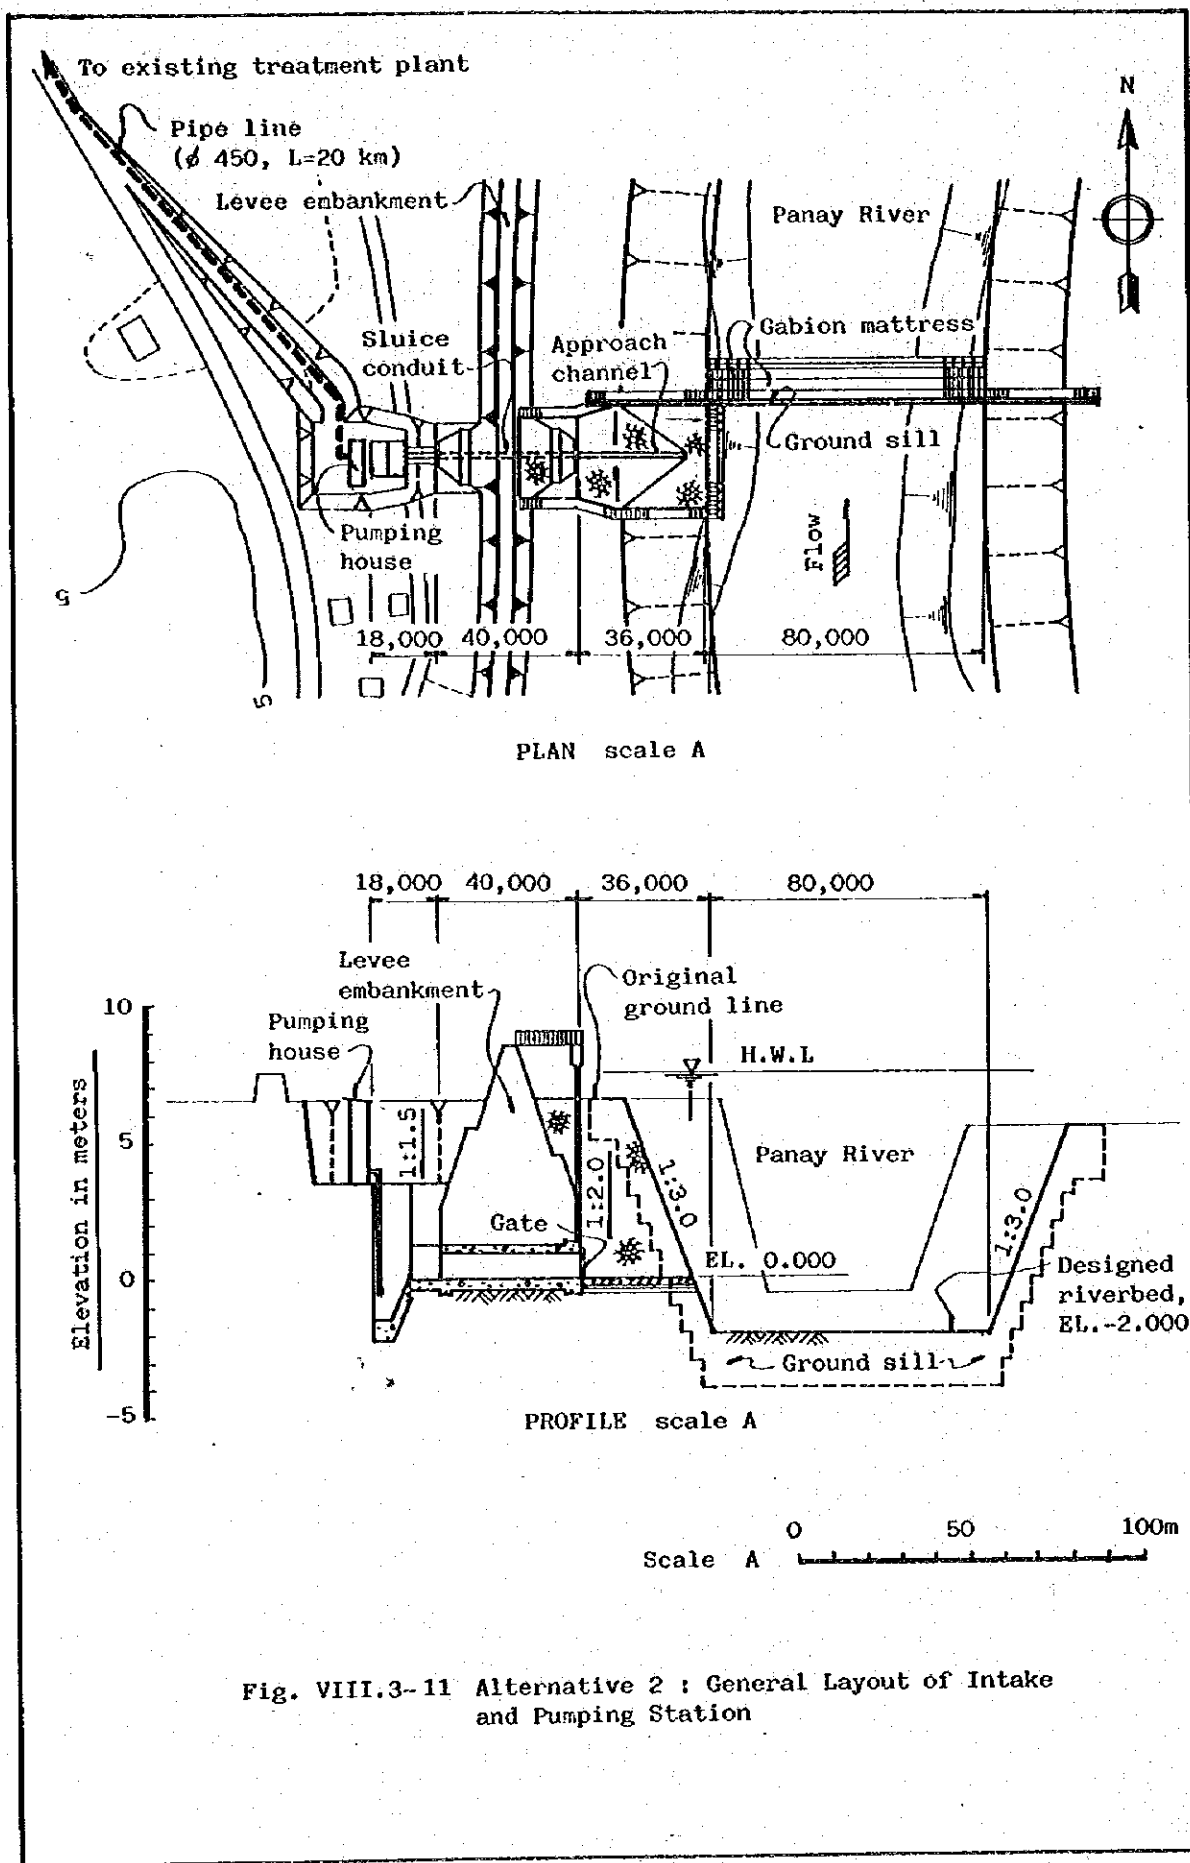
Alternative 2 : General Layout of Intake and Pumping Station
